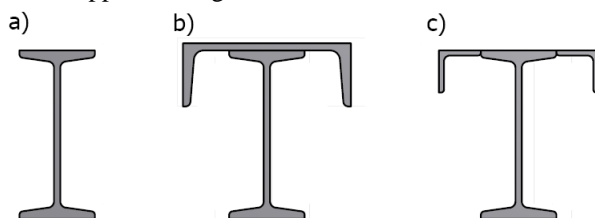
Examples of cross-section of the main girder and the reinforcement of the upper belt
